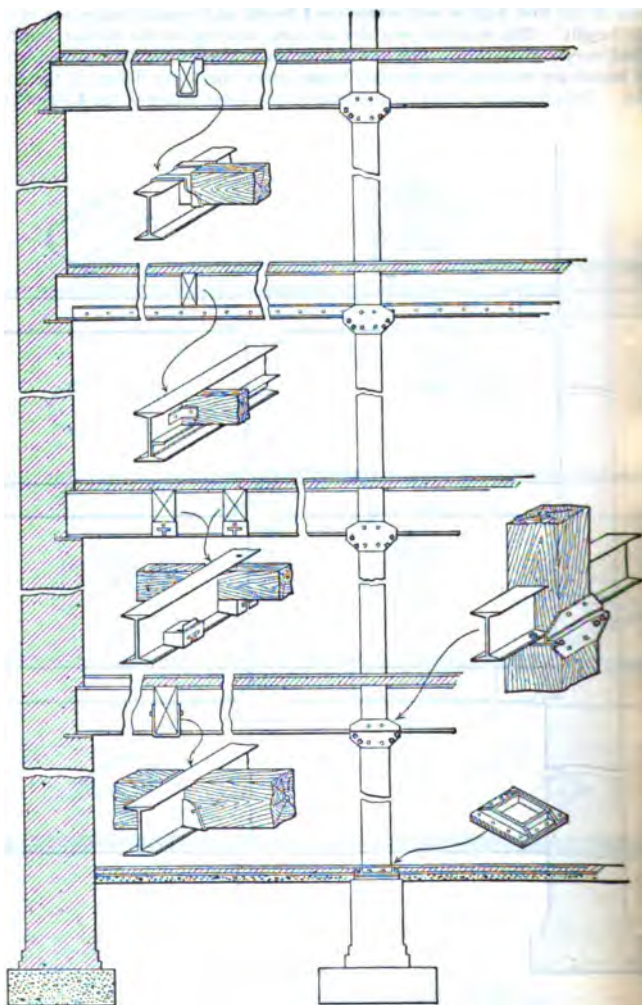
Mill-construction. Framing Steel Beams and Girders
